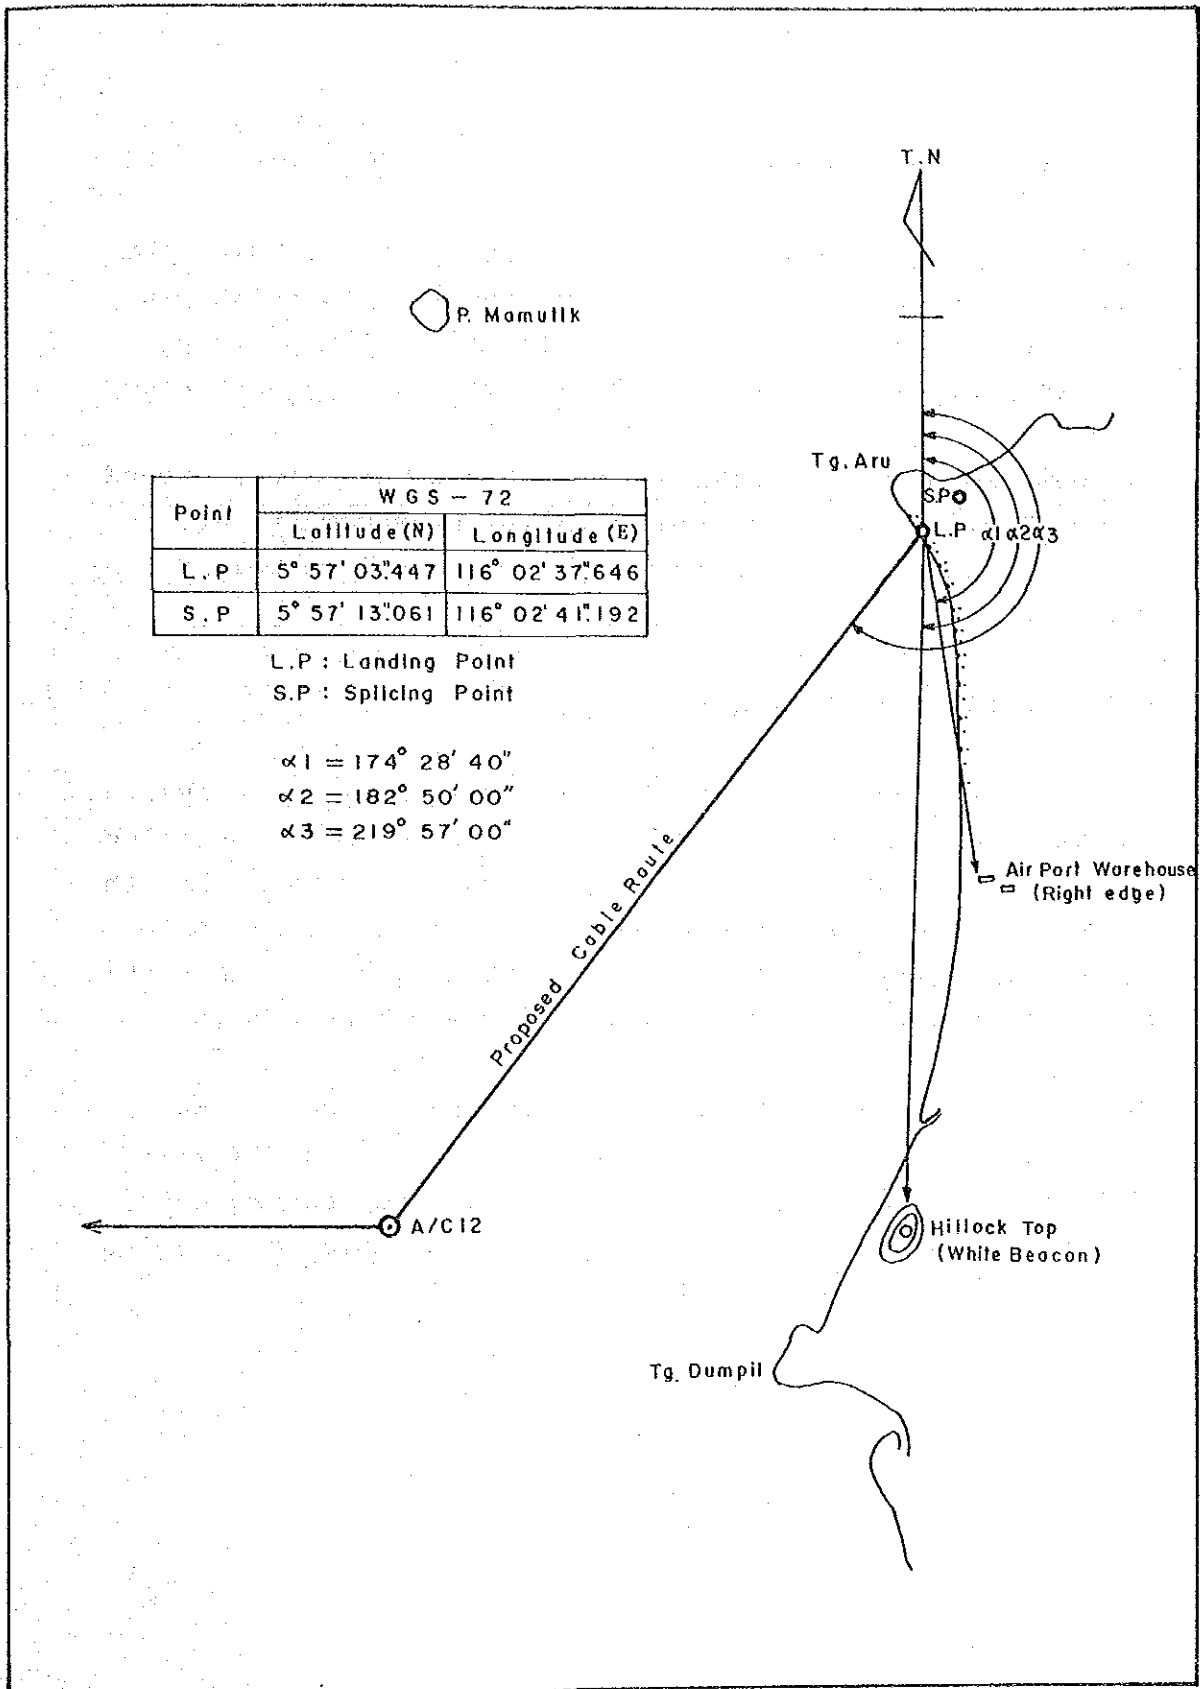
Bearings of Cable Route in Tg. Aru
